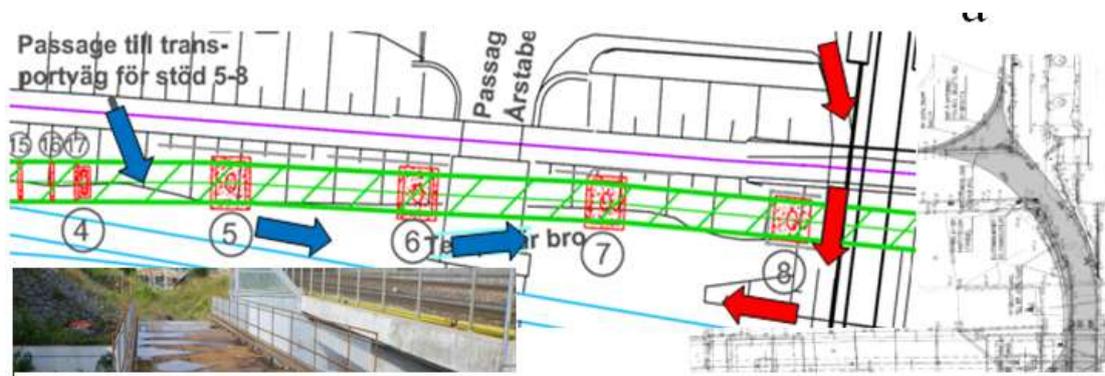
Change in access road to pillar 7 and 8 (red arrows indicate originally planned design and blue arrows indicate employed access road)
